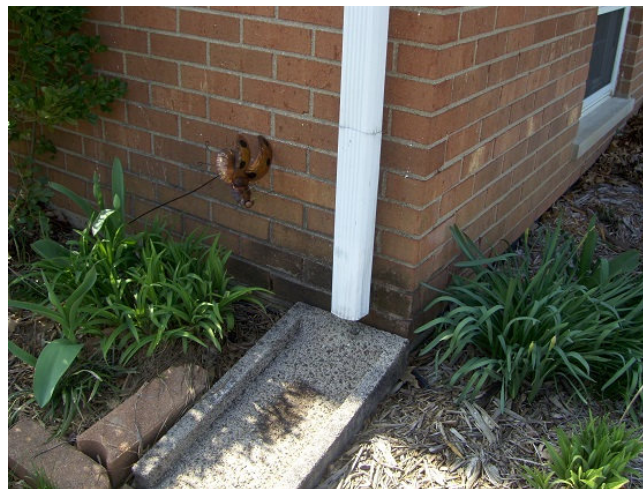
Typical Concrete Down Spout at Landscaped Area
